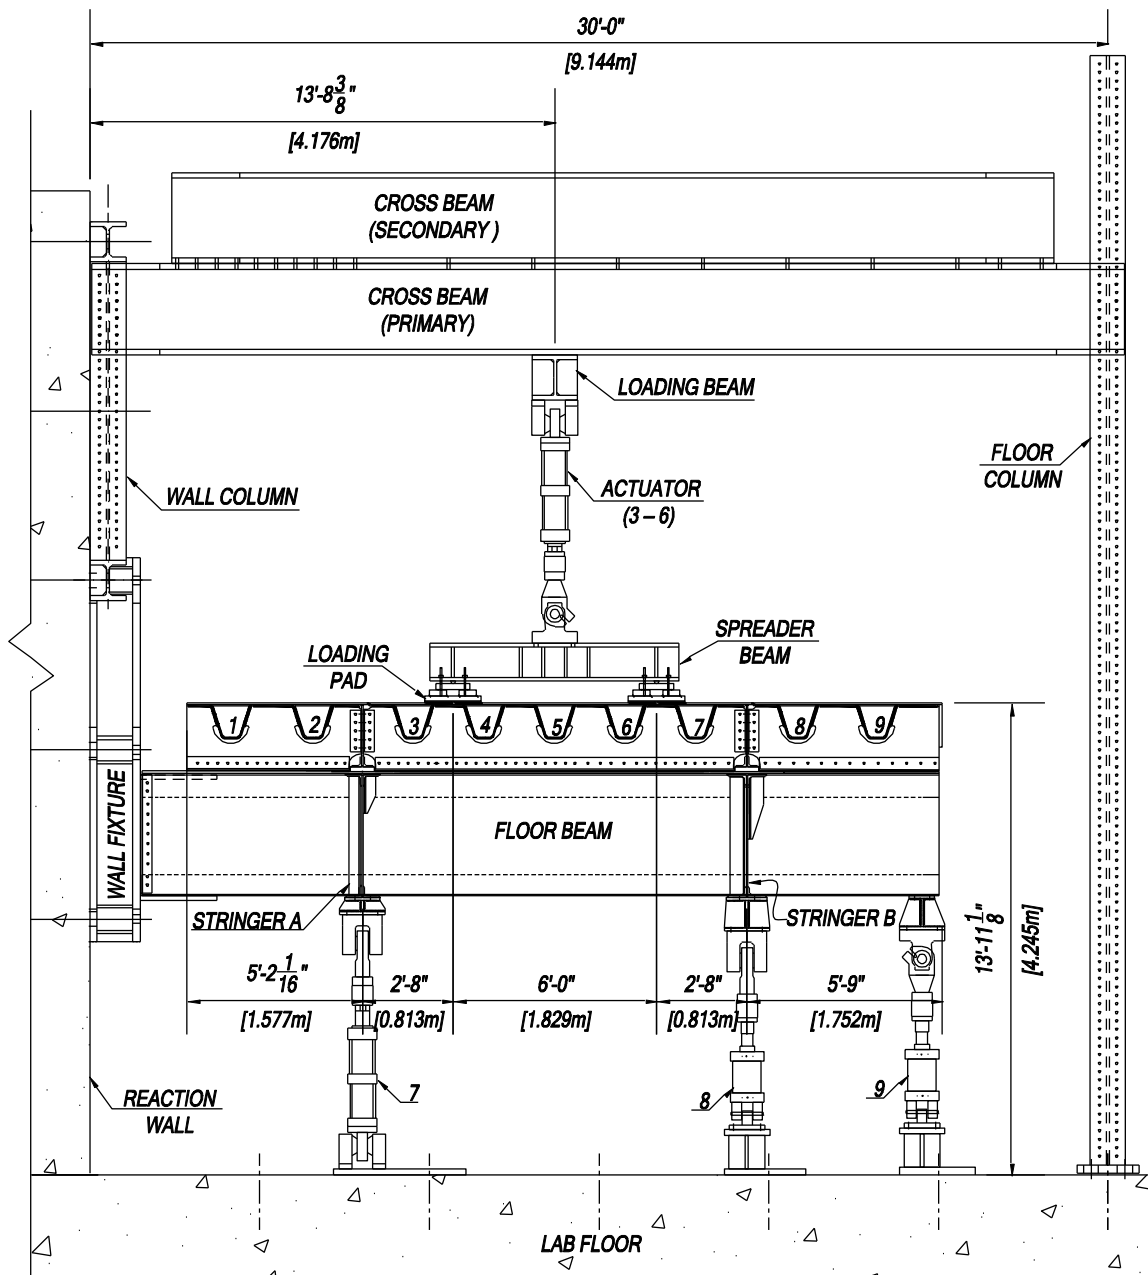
Front elevation of the test setup – looking north (adapted from Alapati, 2012)
